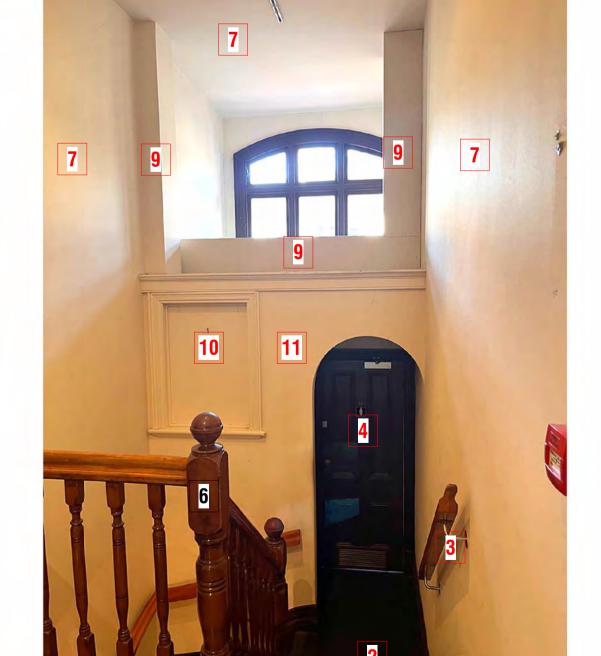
PHOTO - CURRENT VIEW OF STAIR FROM FIRST FLOOR LANDING
